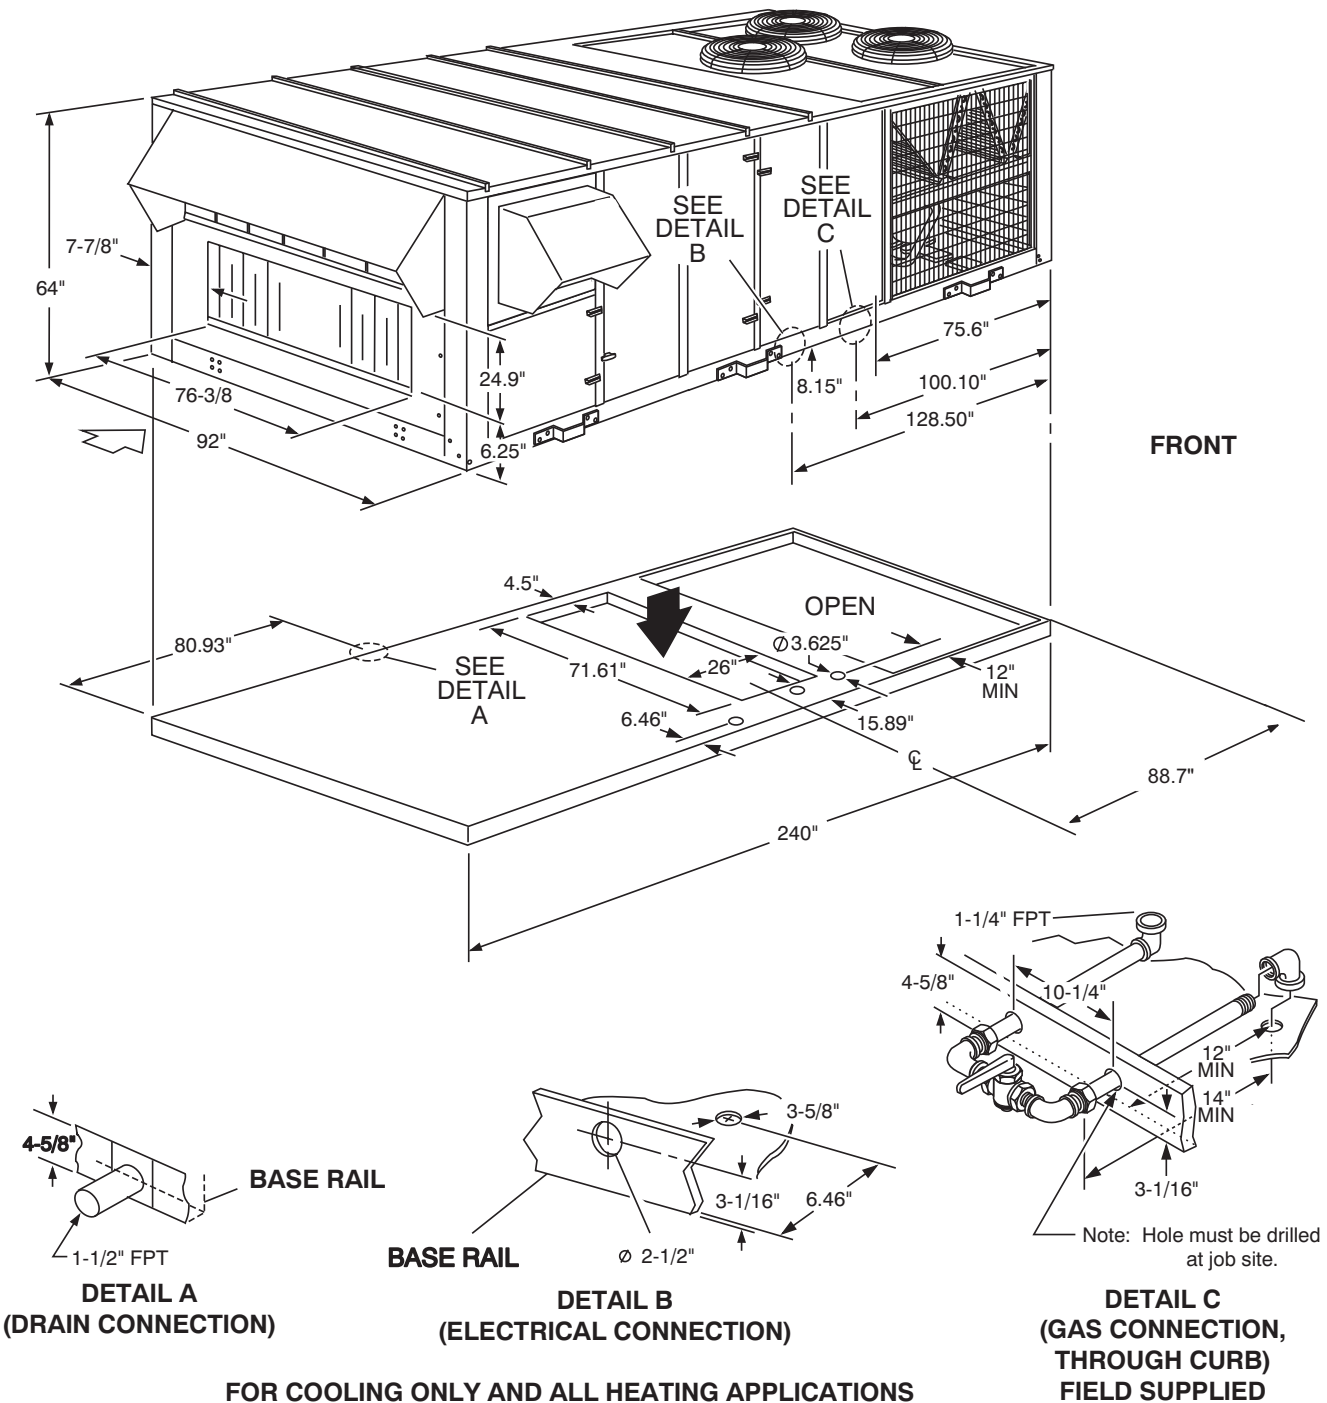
END RETURN, BOTTOM SUPPLY
